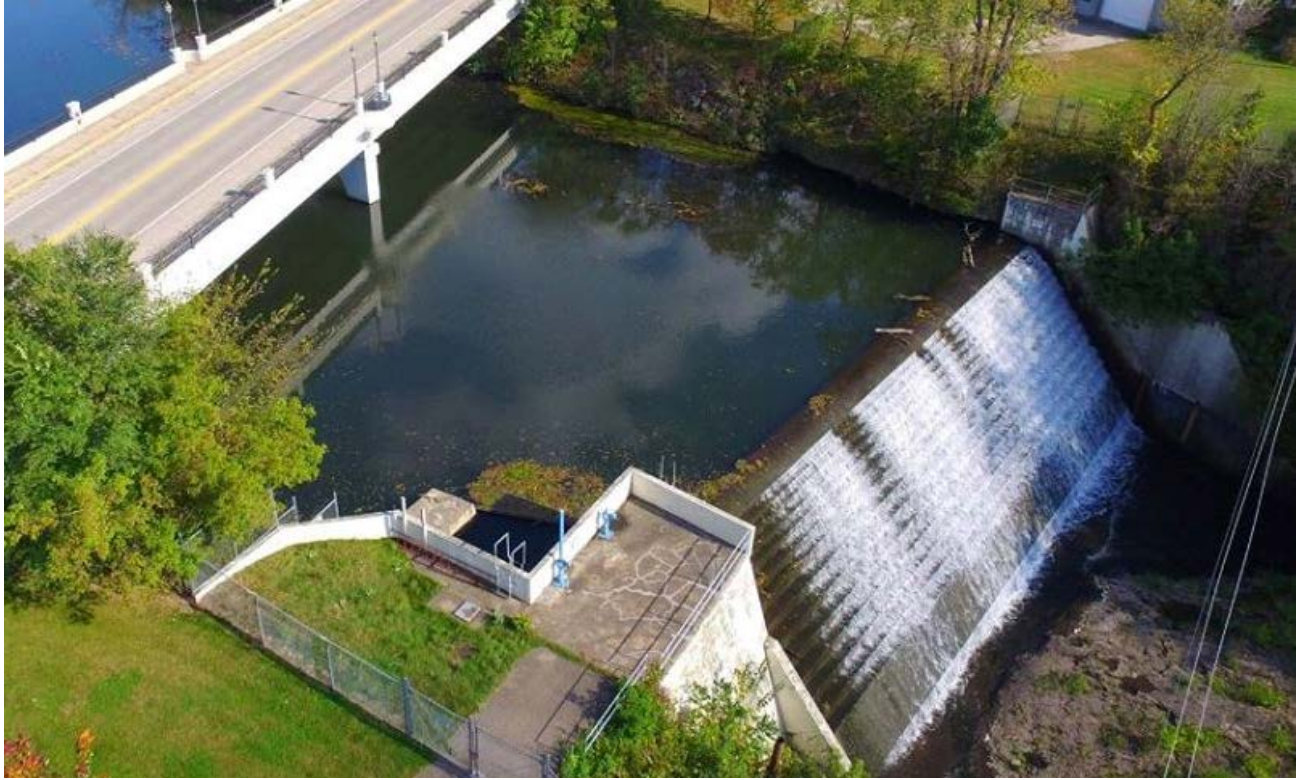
Junction Falls Dam, just below the Winter Street Bridge.
